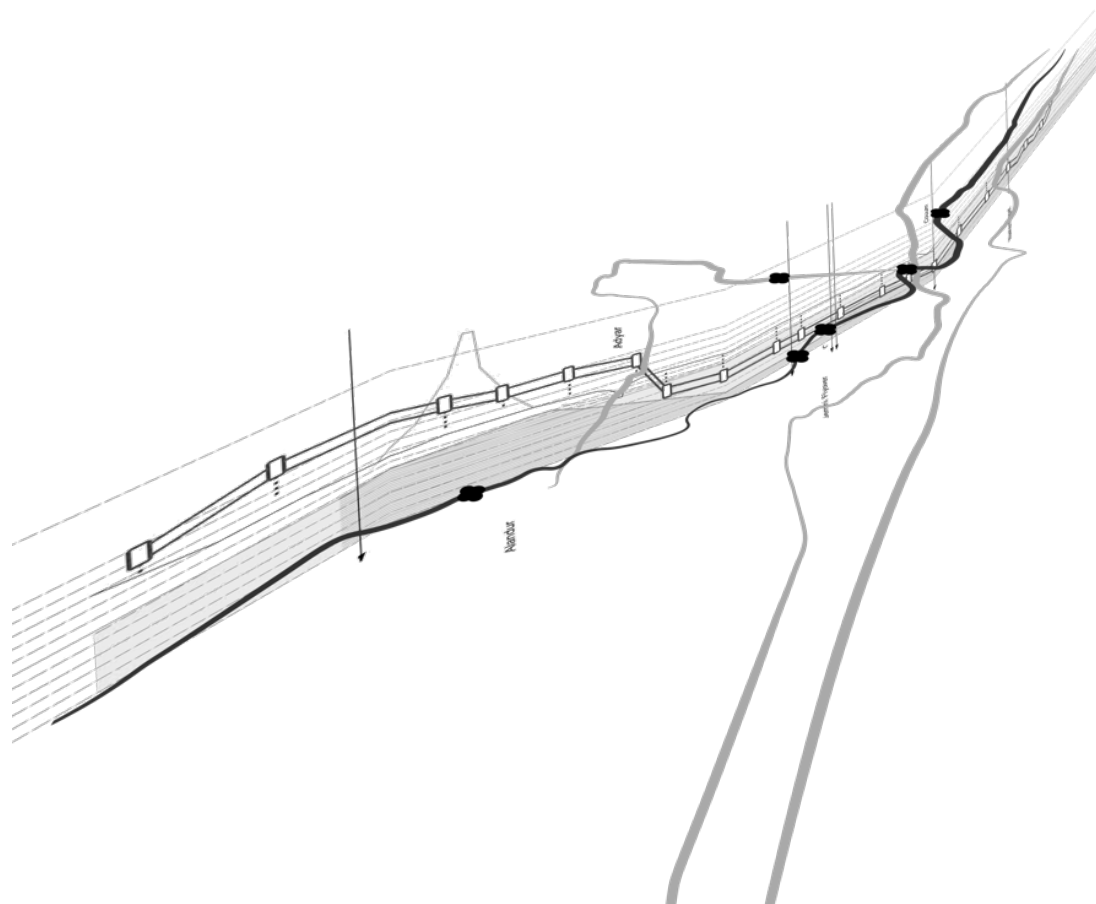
Chennai tunnelling transect, showing depth of tunnel and locations of surface collapses (arrows). Drawing by the author.
